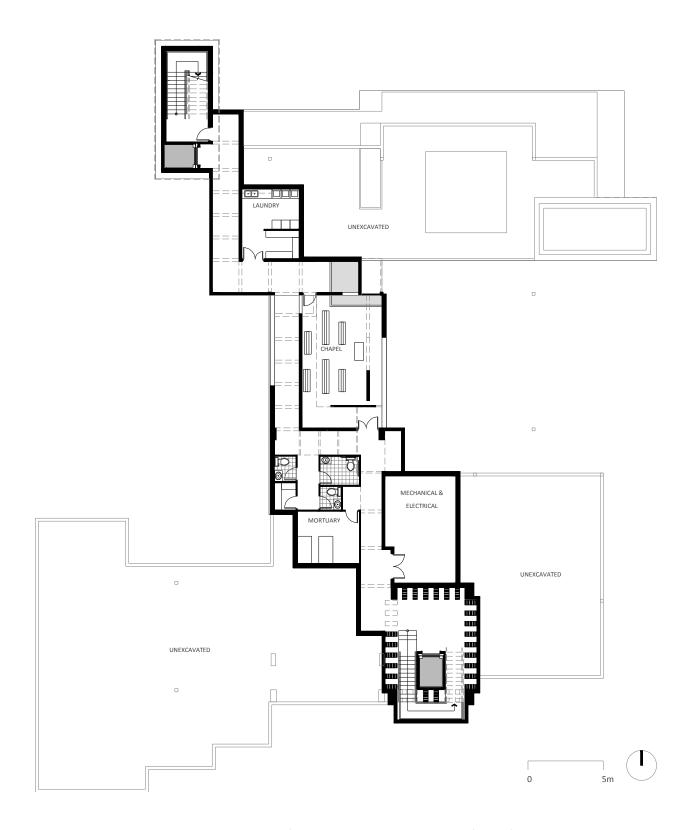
Basement Floor Plan – Chapel (represented by the element of Earth) is located in the Centre
